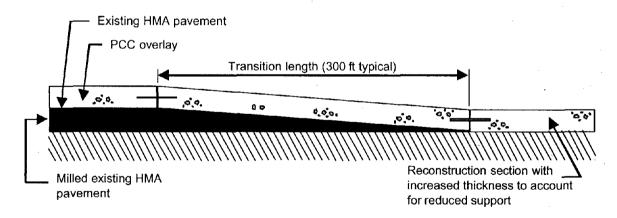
Example transition detail for bridge approaches and overpasses (ACPA 1991b).
